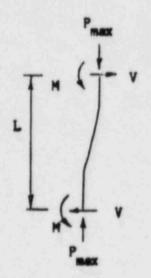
BENT TYPE STRUCTURE OF YORE
